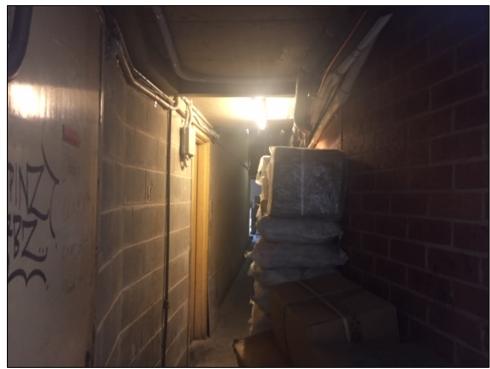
interior access from the loading dock (Site Visit – 8th Feb)
